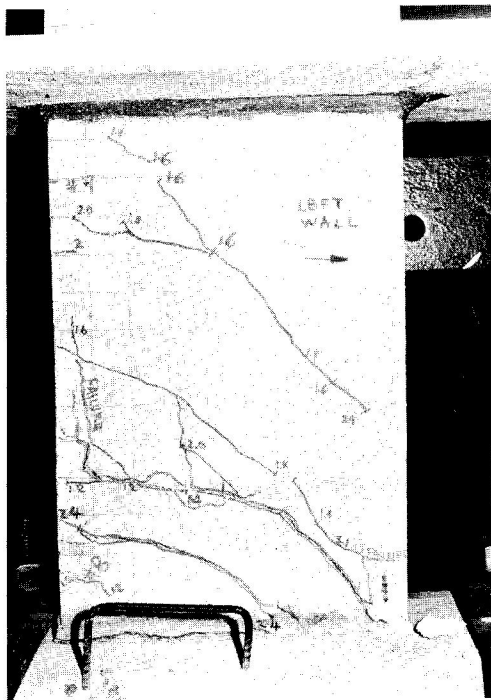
CRACK PATTERN & FAILURE MECHANISM
